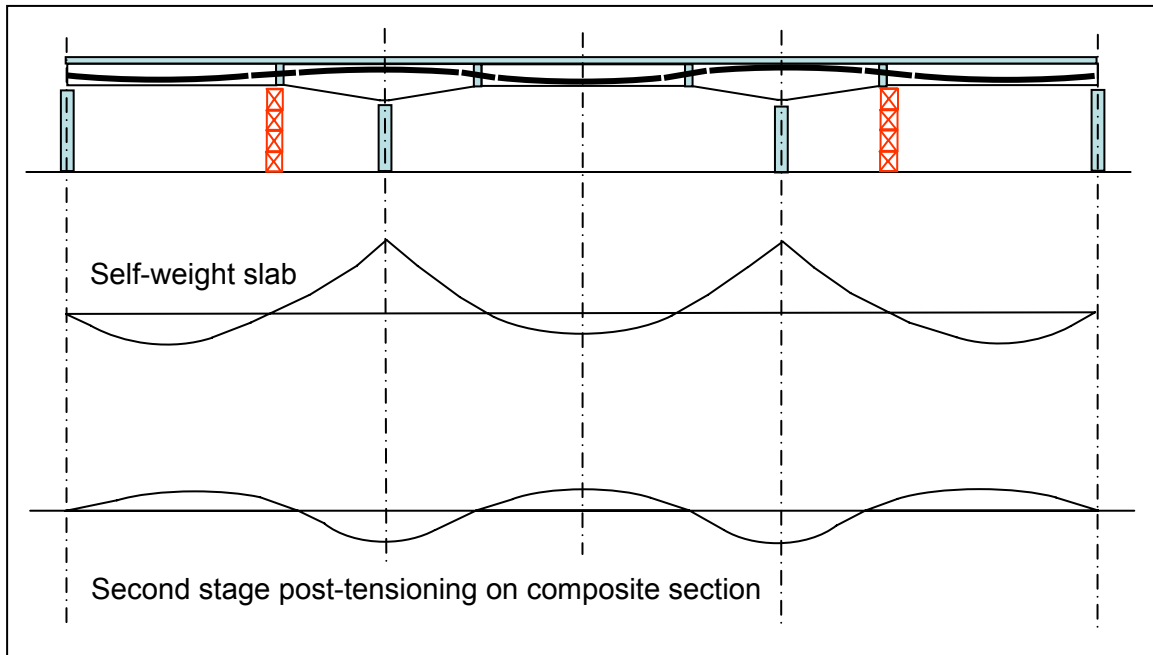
Spliced Girder Construction - Slab and Stage 2 PT Moments
